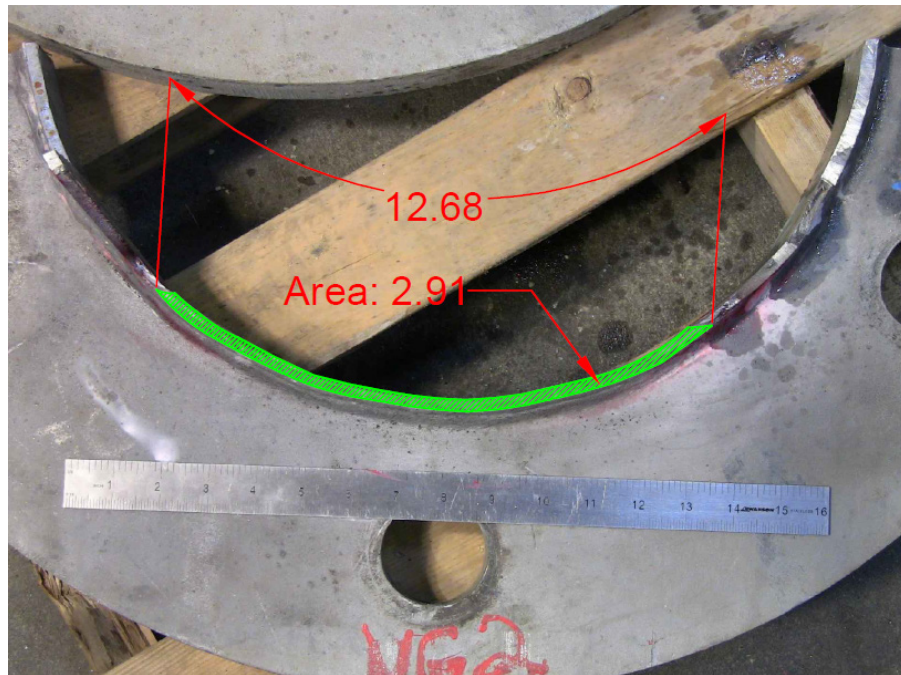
Photo. Specimen 2U5 fracture surface.
